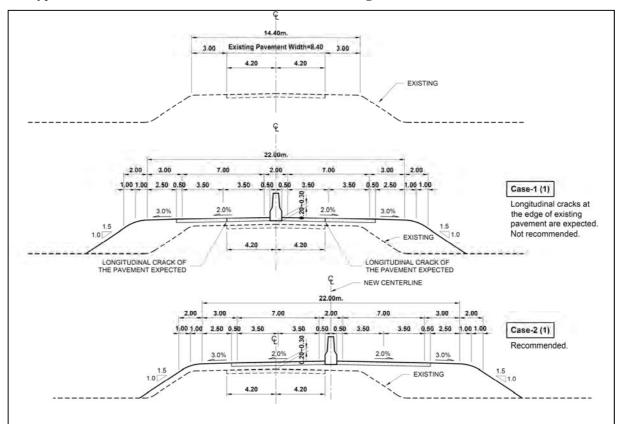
TYPICAL CROSS SECTION PATTERN-1: EXISTING PAVEMENT WIDTH=8.40M.
